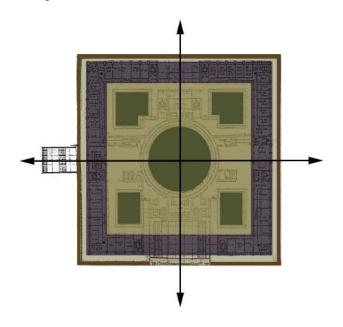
Symmetrical and Geometrical Plan of Parliament House Islamabad, Pakistan. Source: Authors
